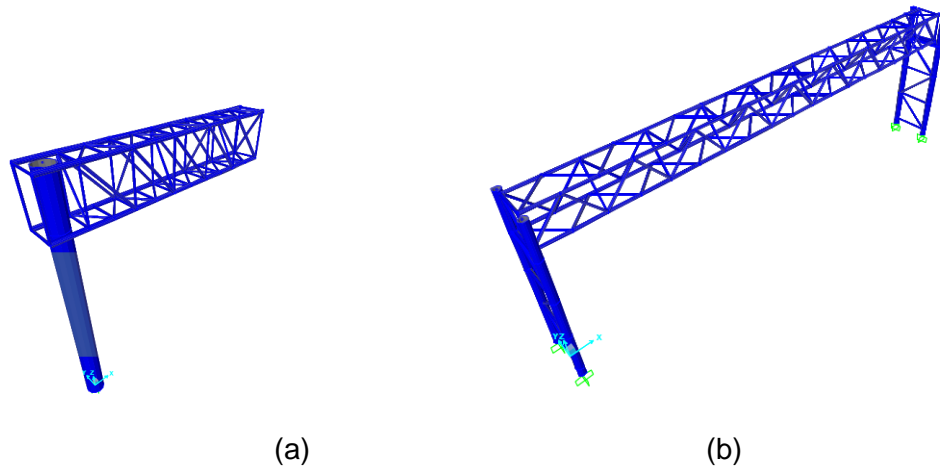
State of Iowa sign structure models: (a) cantilevered; and (b) bridge-type examples
